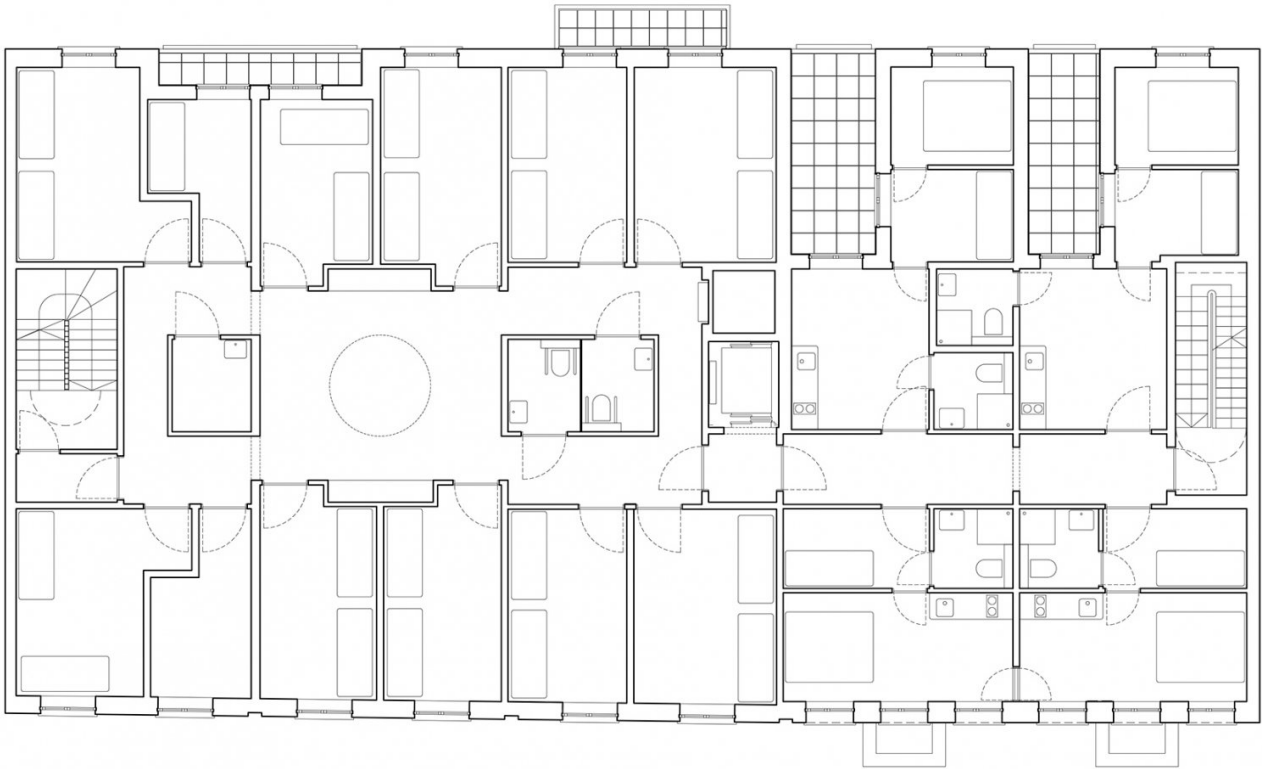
, first level floor plan of Pension van Schoonhoven (BULK architecten, ca. 2019)
